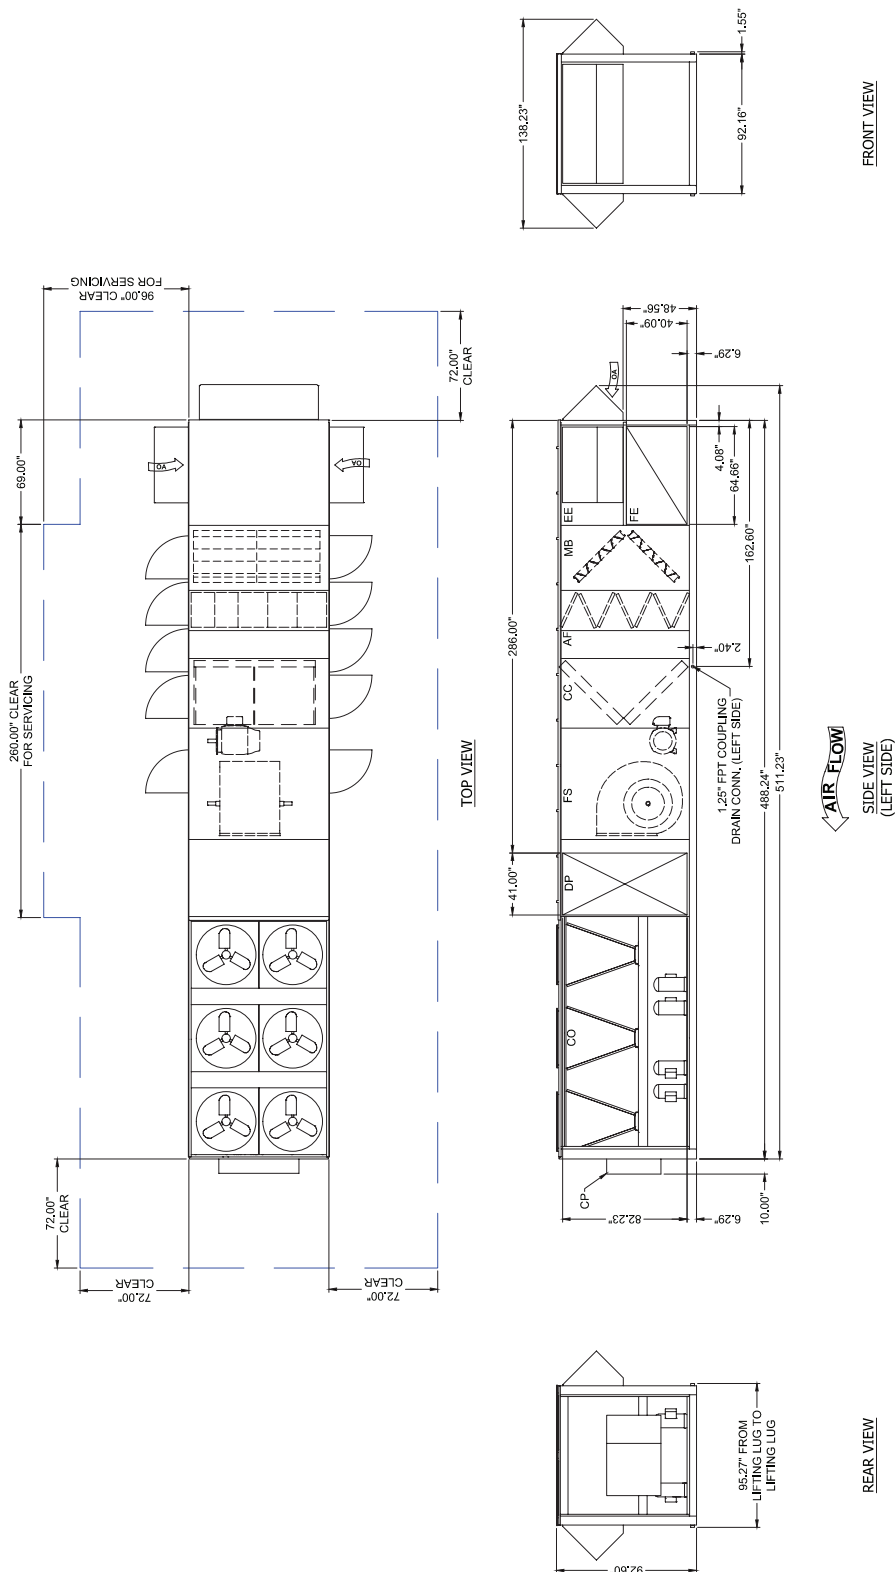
GENERAL ARRANGEMENT DRAWING
